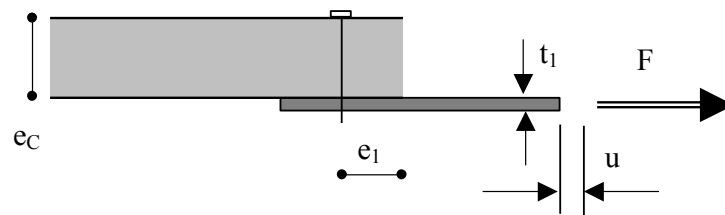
Shear test assembly for screws passing through the panel (ECCS & CIB, 2009).
